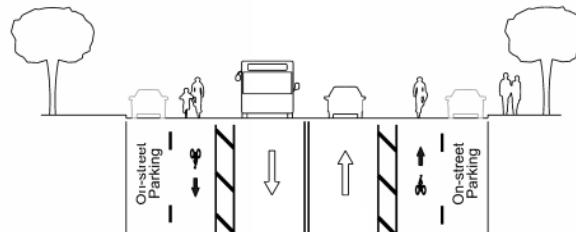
Typical Proposed Cross Section for Teri Road – Freidrich Ln to Nuckols Crossing Rd
